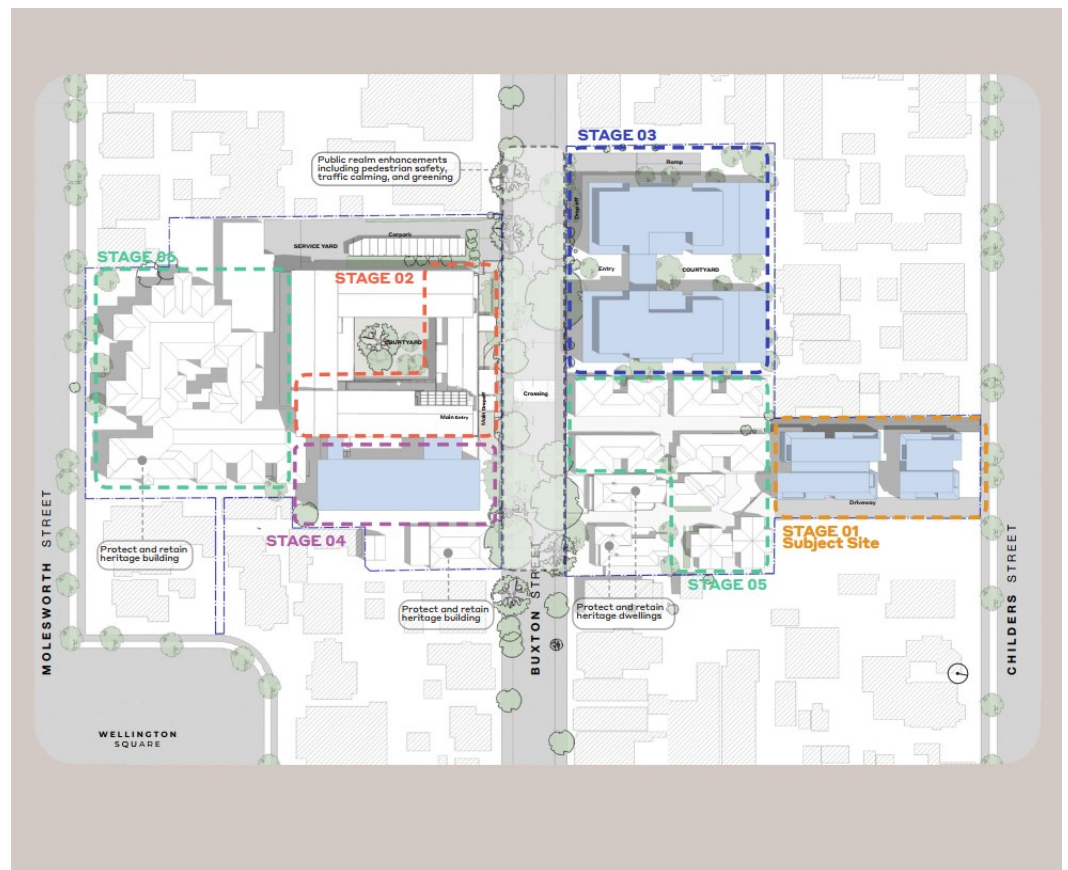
Helping Hand Master Plan (Woods Bagot)
